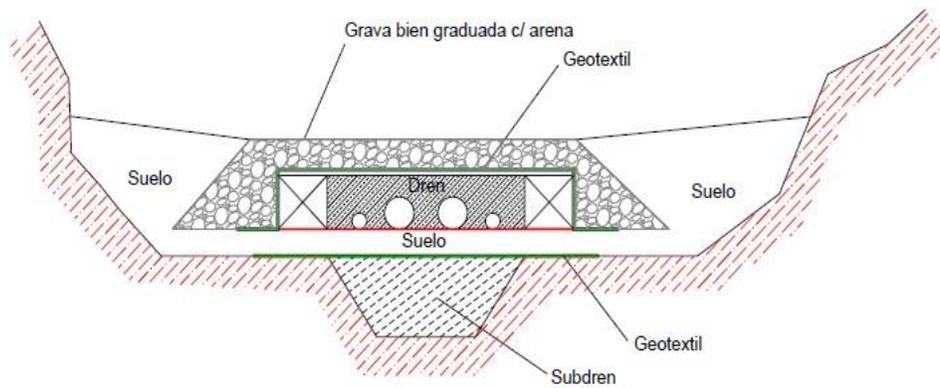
A. The foundation drainage system showing sub-drains to collect rain water and drains for seepage. The entire drainage system is covered with a gabion structure and geotextile. A geotextile separates the sub-drain and drains.
